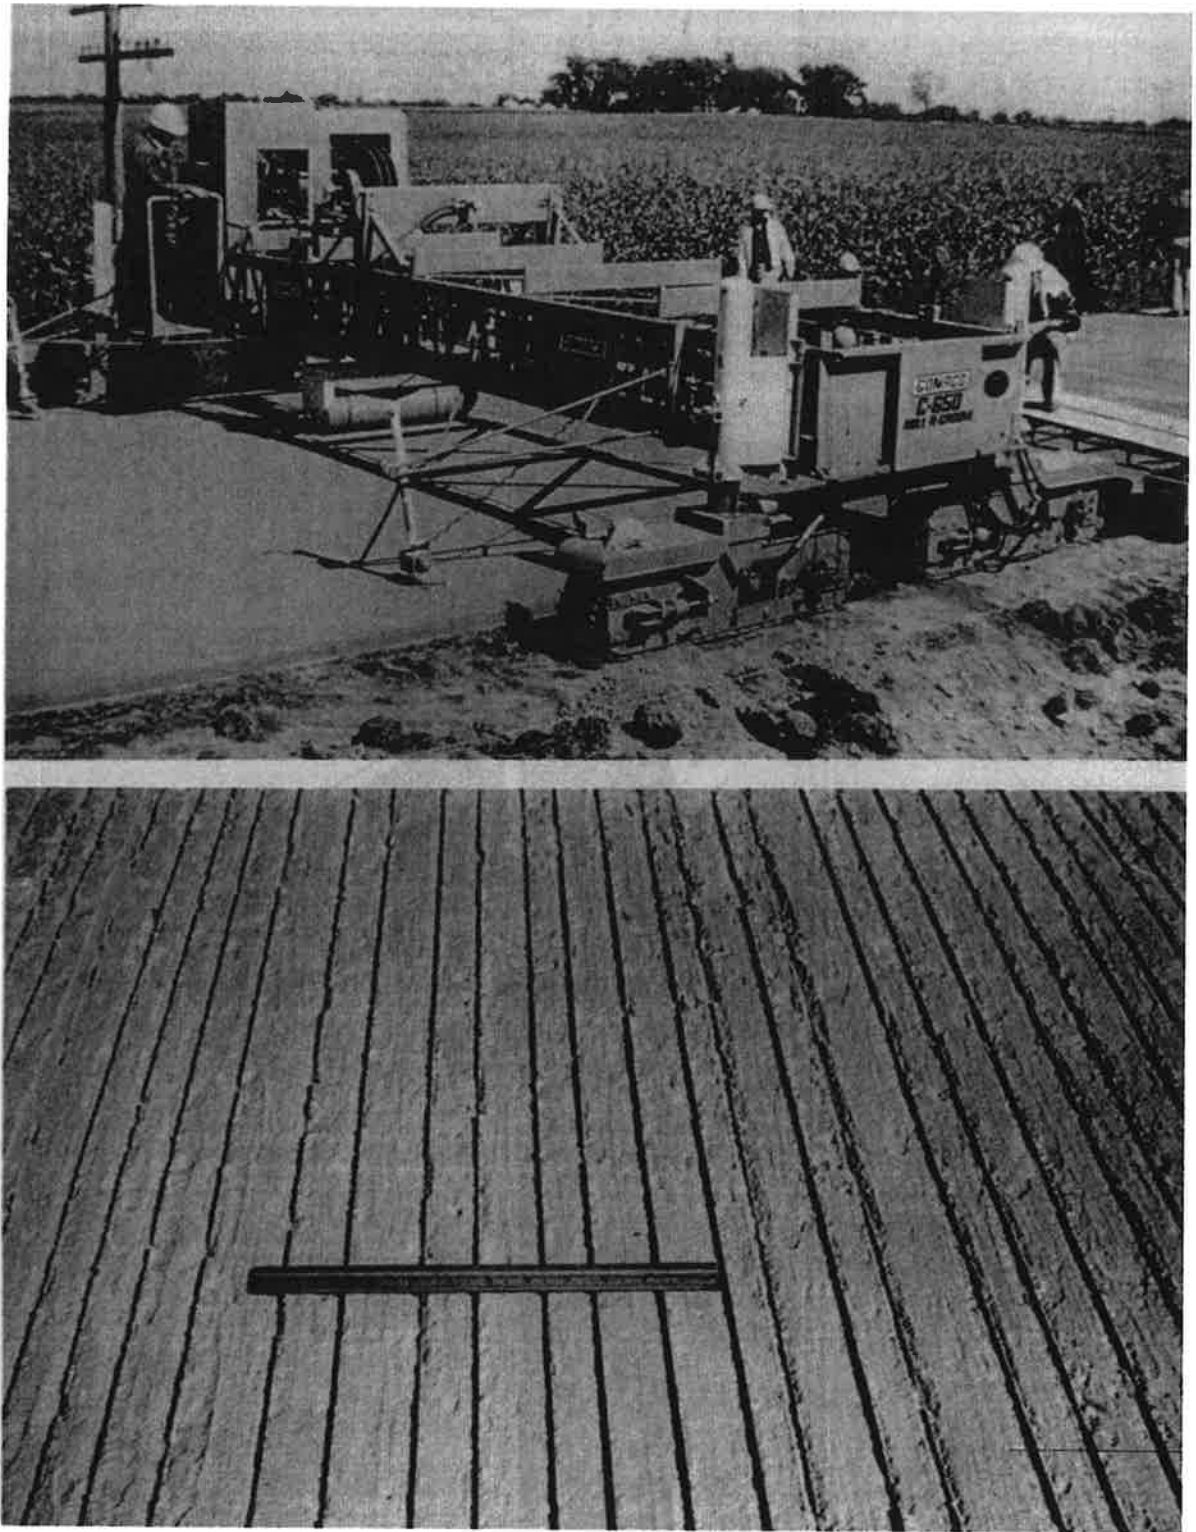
PLASTIC GROOVING TECHNIQUE USING A RIBBED ROLLER TUBE
